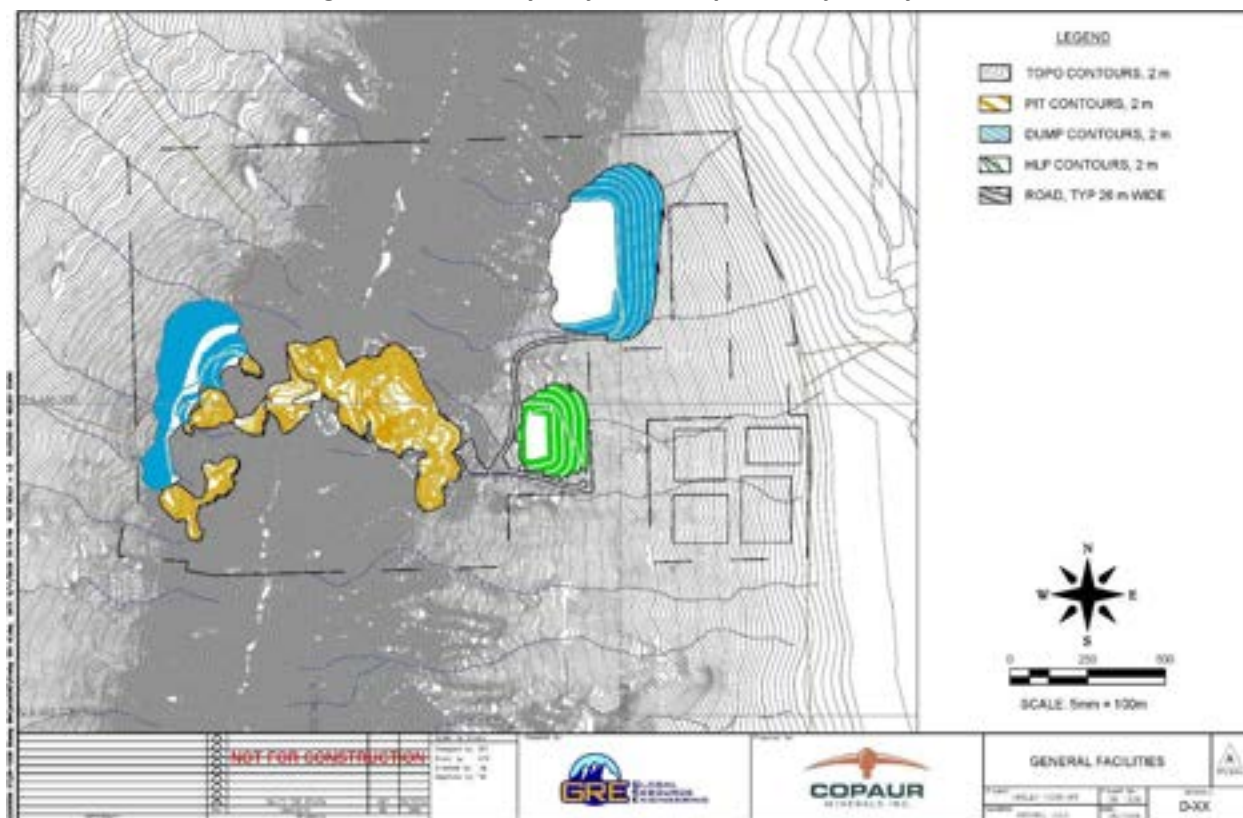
Phase Pit and Site Plan Layout Year 1
